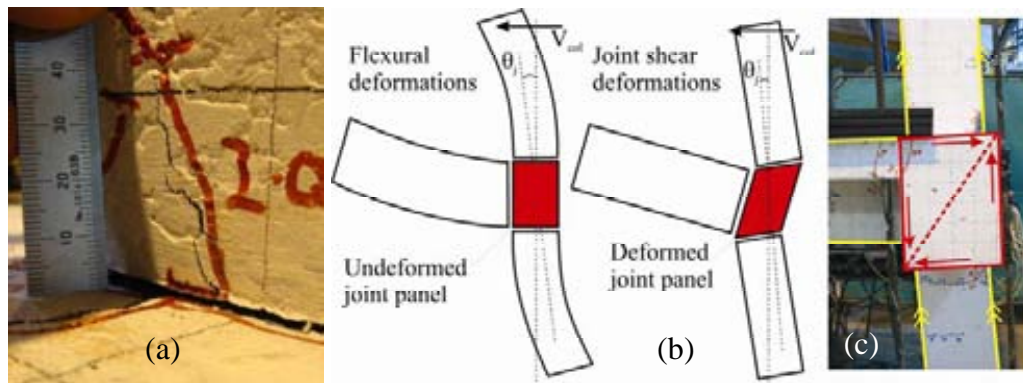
a) 4mm gap at the dry connection between top column and joint; b-c) Probable hidden joint shear deformation in the exterior joint with transverse beams.
